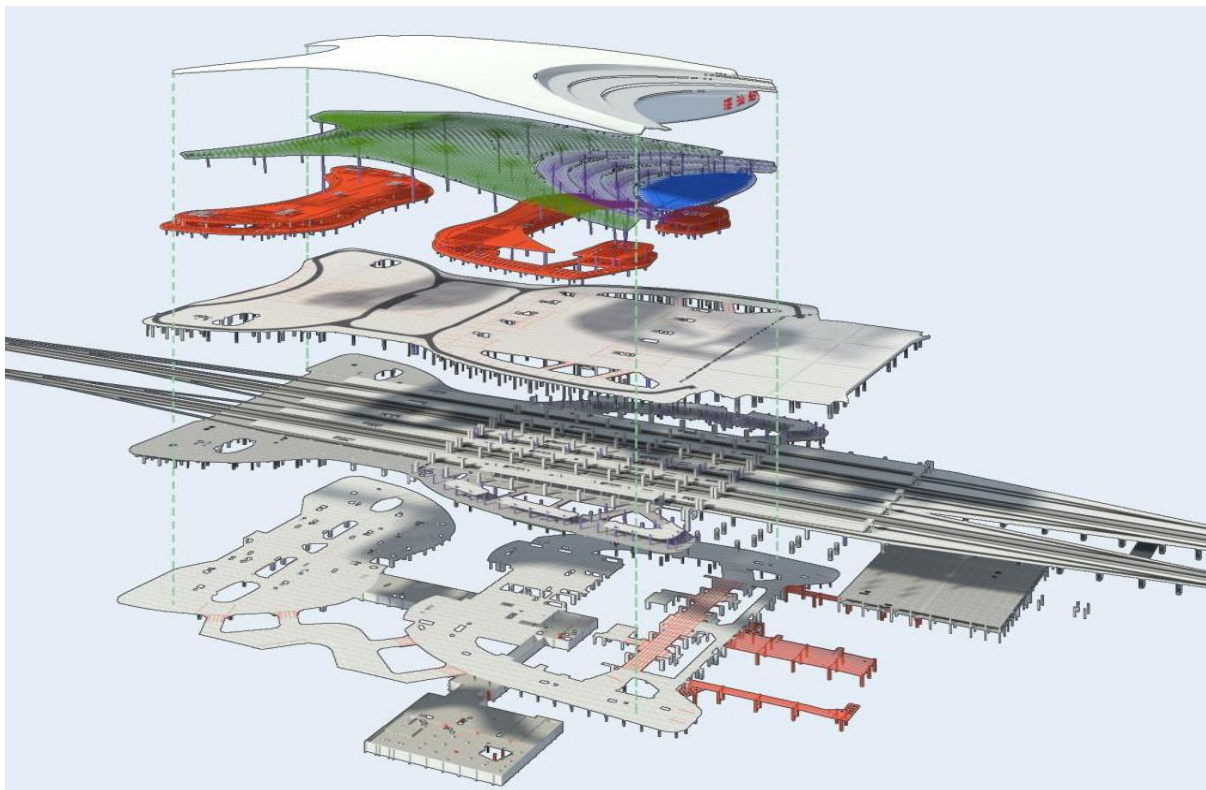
Shenshan Station Floor-by-Floor Schematic Diagram
